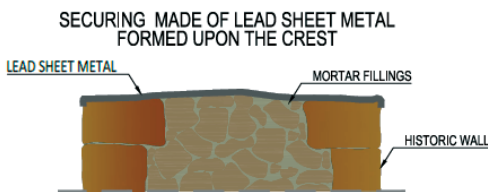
Making a sweet metal cover on the Wall crest./ Securing made of lead sheet metal formed upon the crest./ Lead sheet metal/ Mortar fillings / Historic wall/
